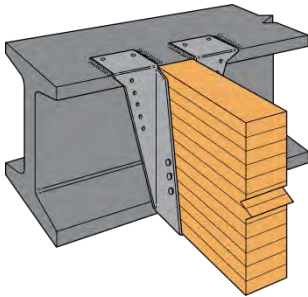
Welded Hanger Installation (See footnote 4)
